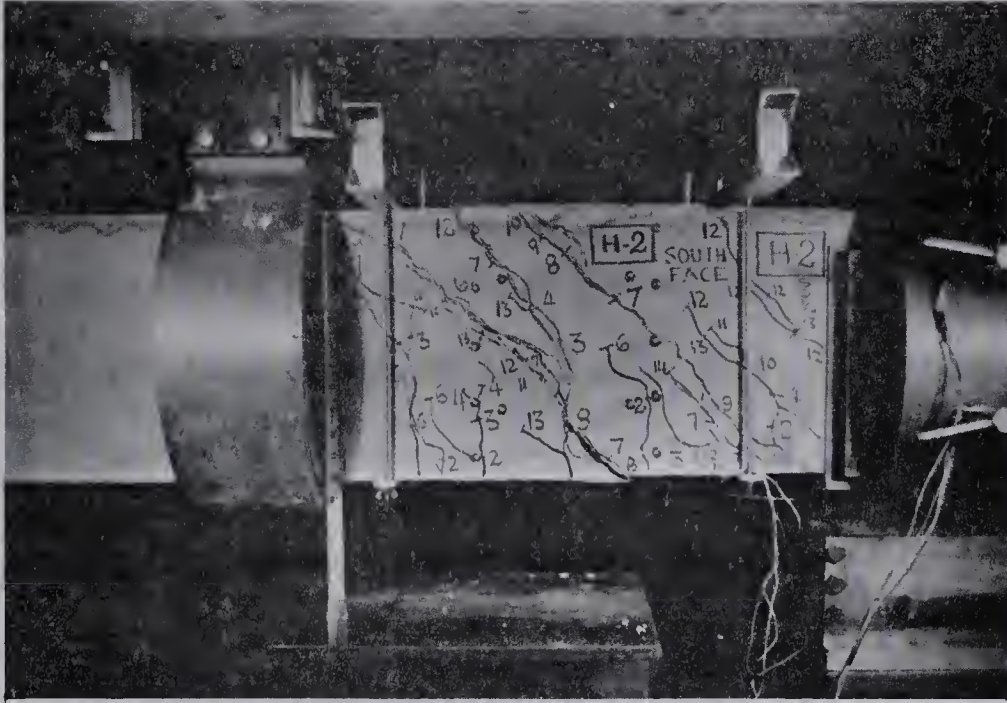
CRACK PATTERN FOR SOUTH FACE OF BEAM H-2
